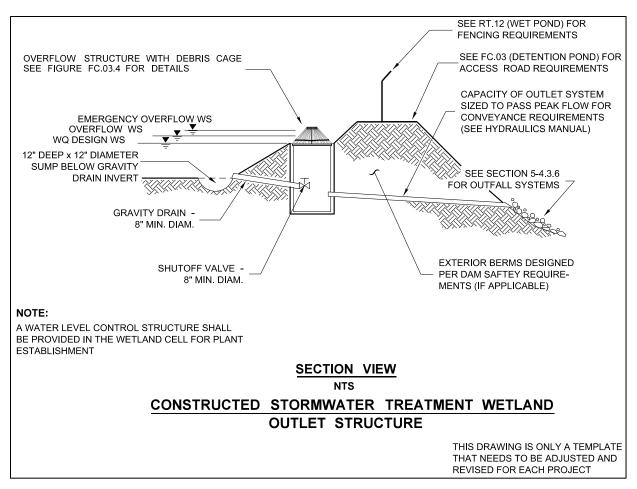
Constructed stormwater treatment wetland outlet structure.
